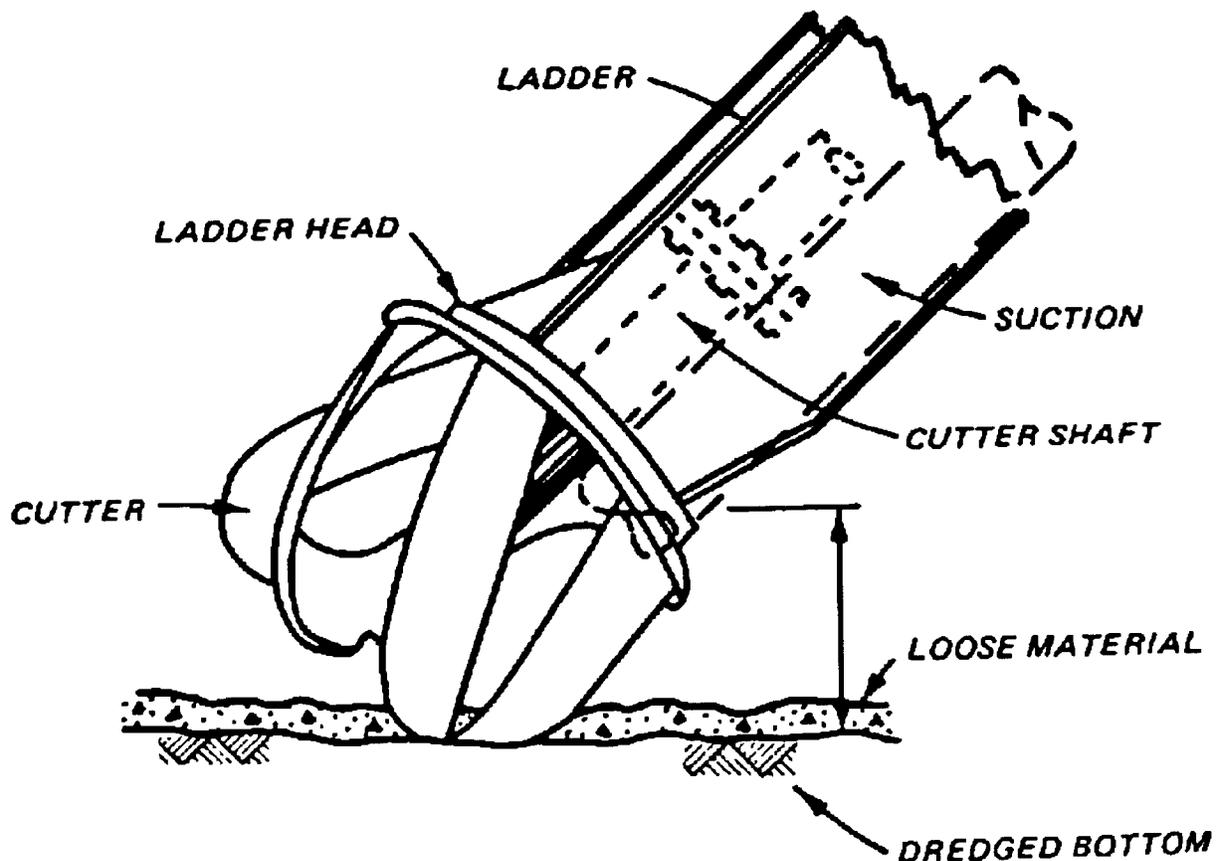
Standard Cutter Assembly, Spiral Basket Cutter
